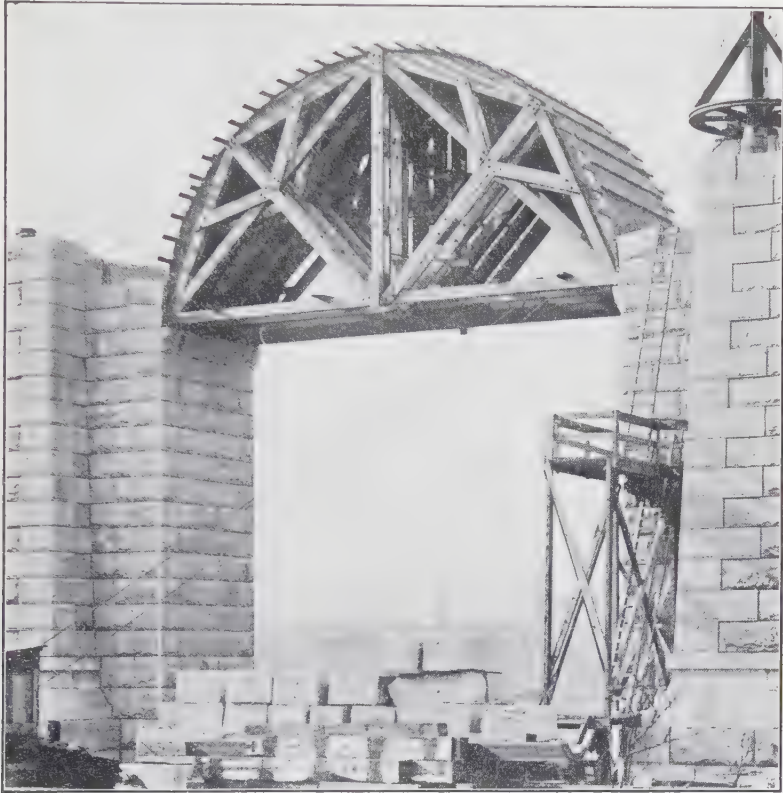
Center for Pier Arch of Queensboro Bridge, New York.
